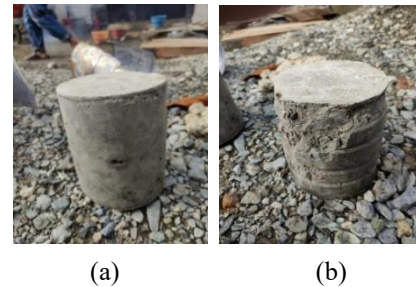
The failure patterns of the tested concrete specimens (a) Plain Tin Confined Specimens (b) Corrugated Tin Confined Specimens
